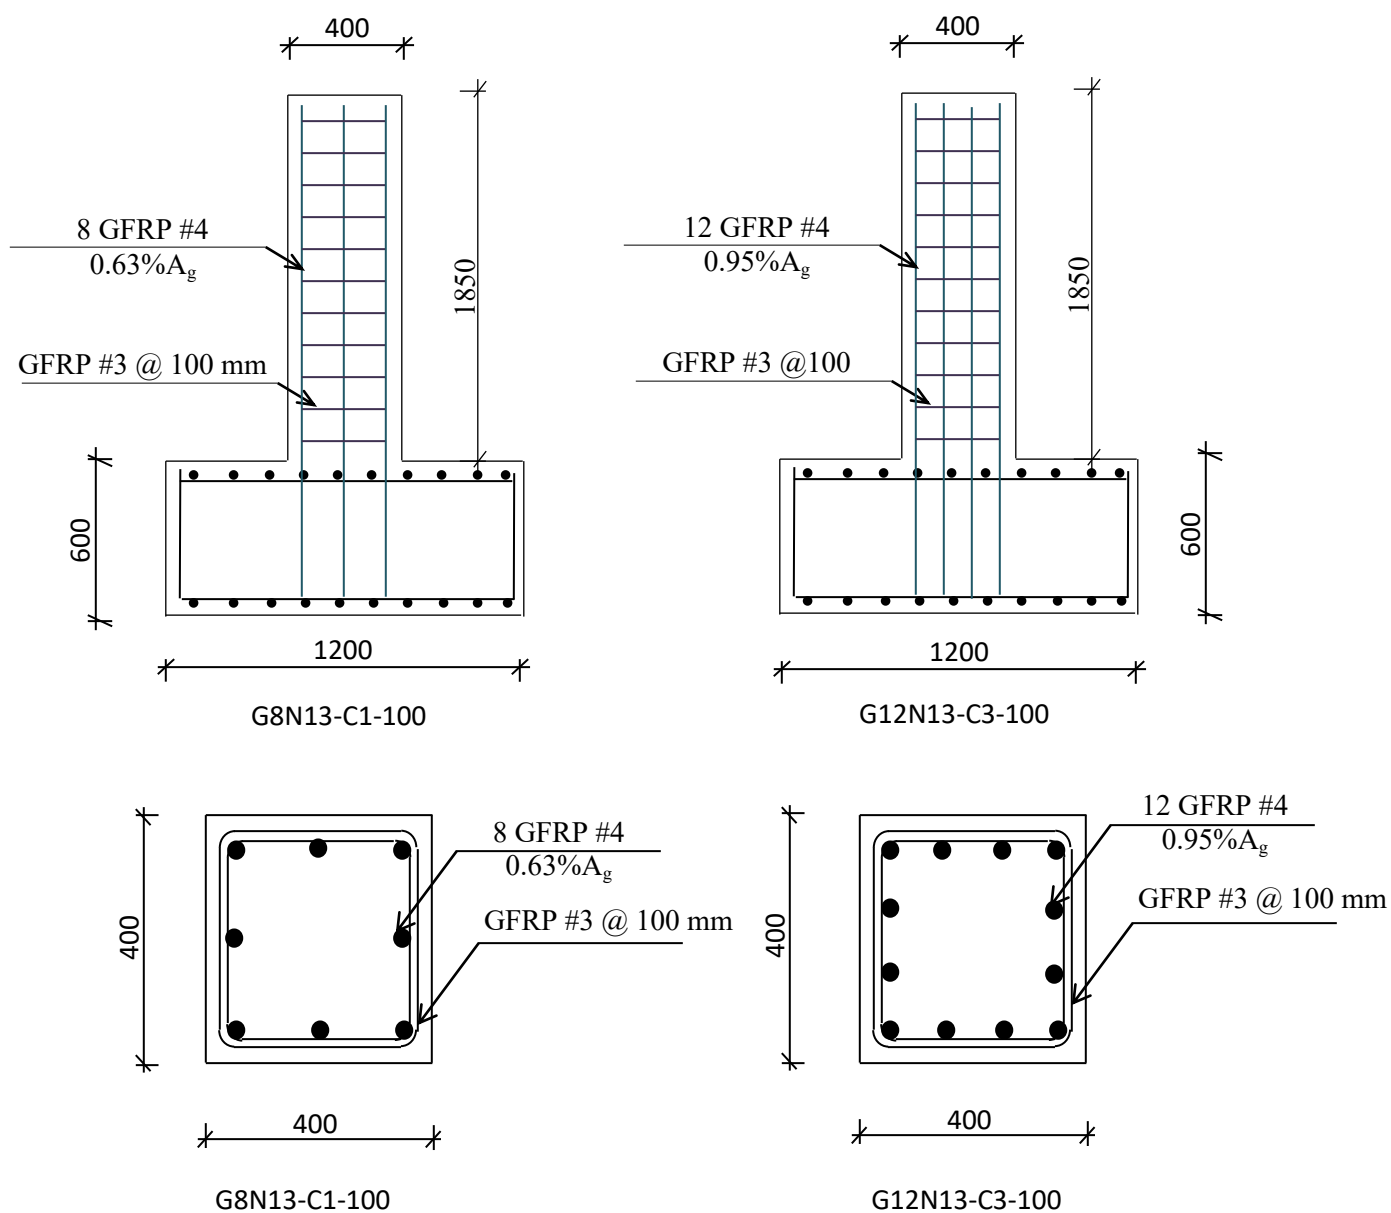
Concrete dimensions and the reinforcement details (dimensions in mm)
